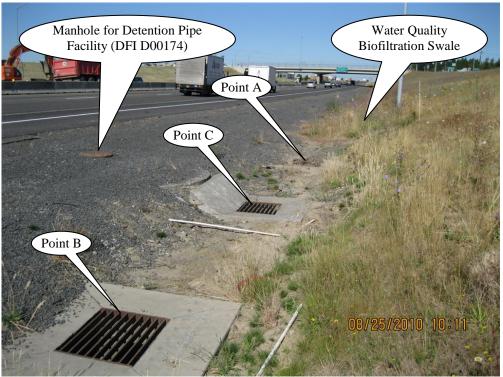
Inlets at middle of water quality biofiltration swale (Points A, B, C). Manhole shown is associated with detention pipe facility (DFI D00174) (Point D). Photo taken facing west.
